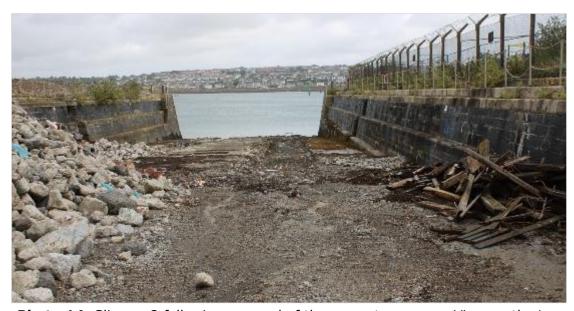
Showing concrete runners on Slipway 2 extending north into the Cleddau. View west. No scale.
